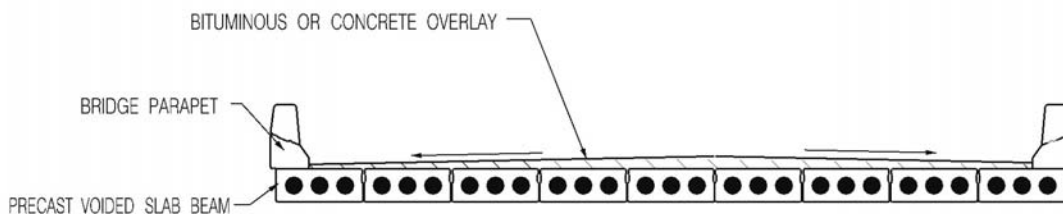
NORMAL CROSS SLOPE SECTION WITH FLAT BEAMS
